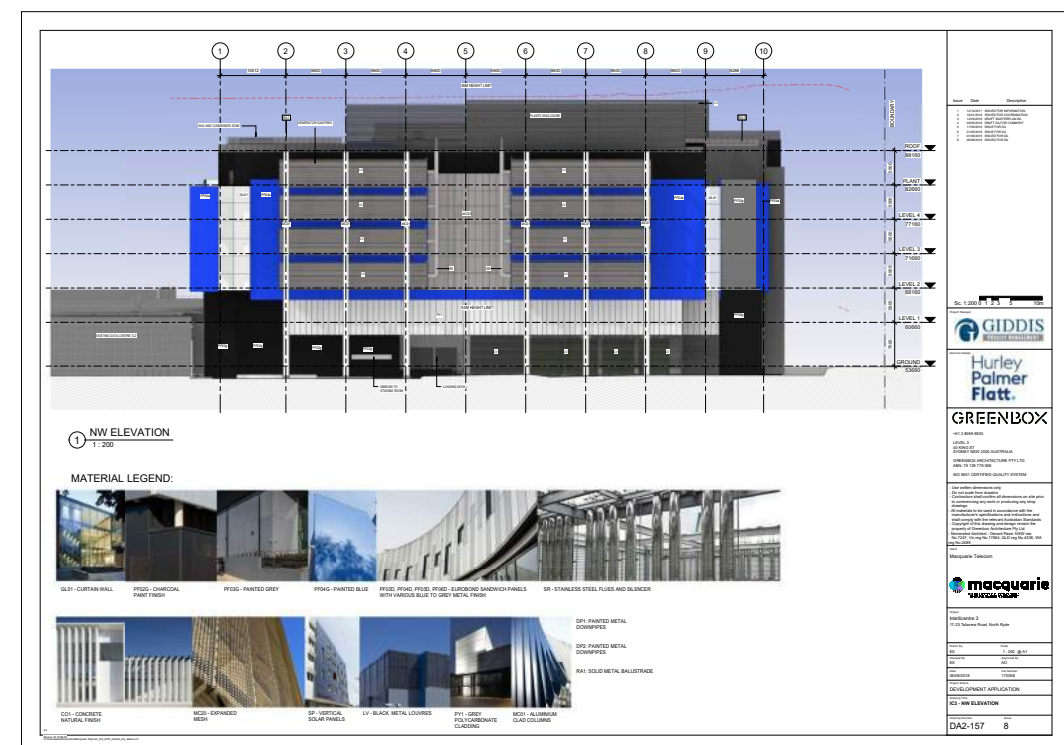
DA Approved IC3W - NW Elevation (Source: GreenBox)
